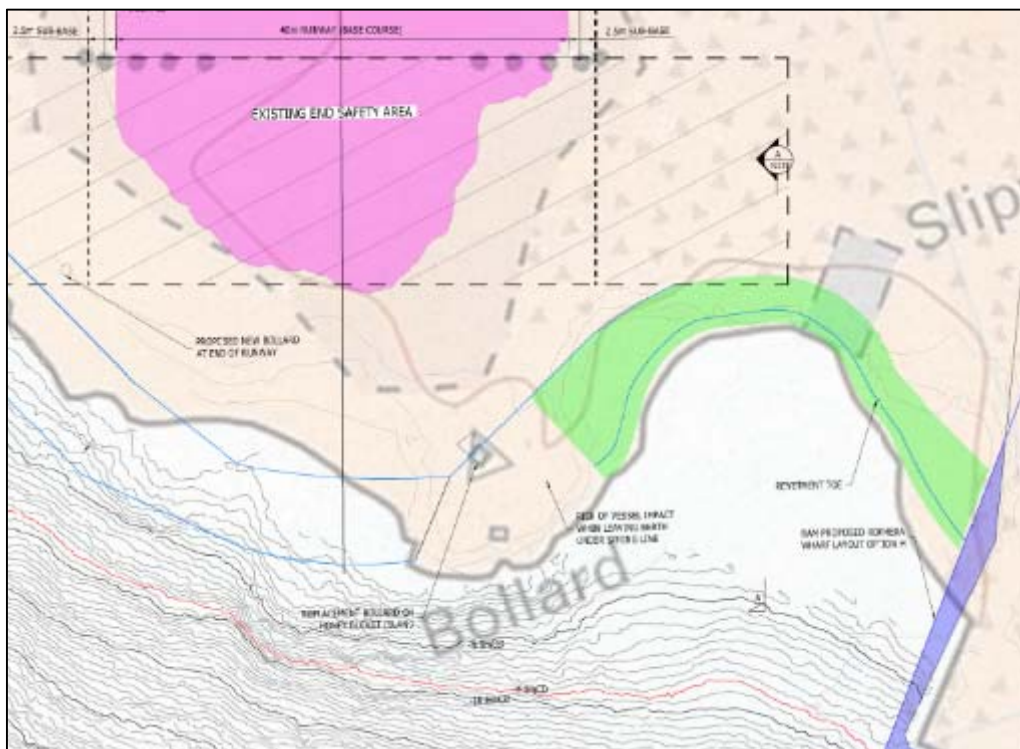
Proposed Extent of Reconstruction of the Embankment
